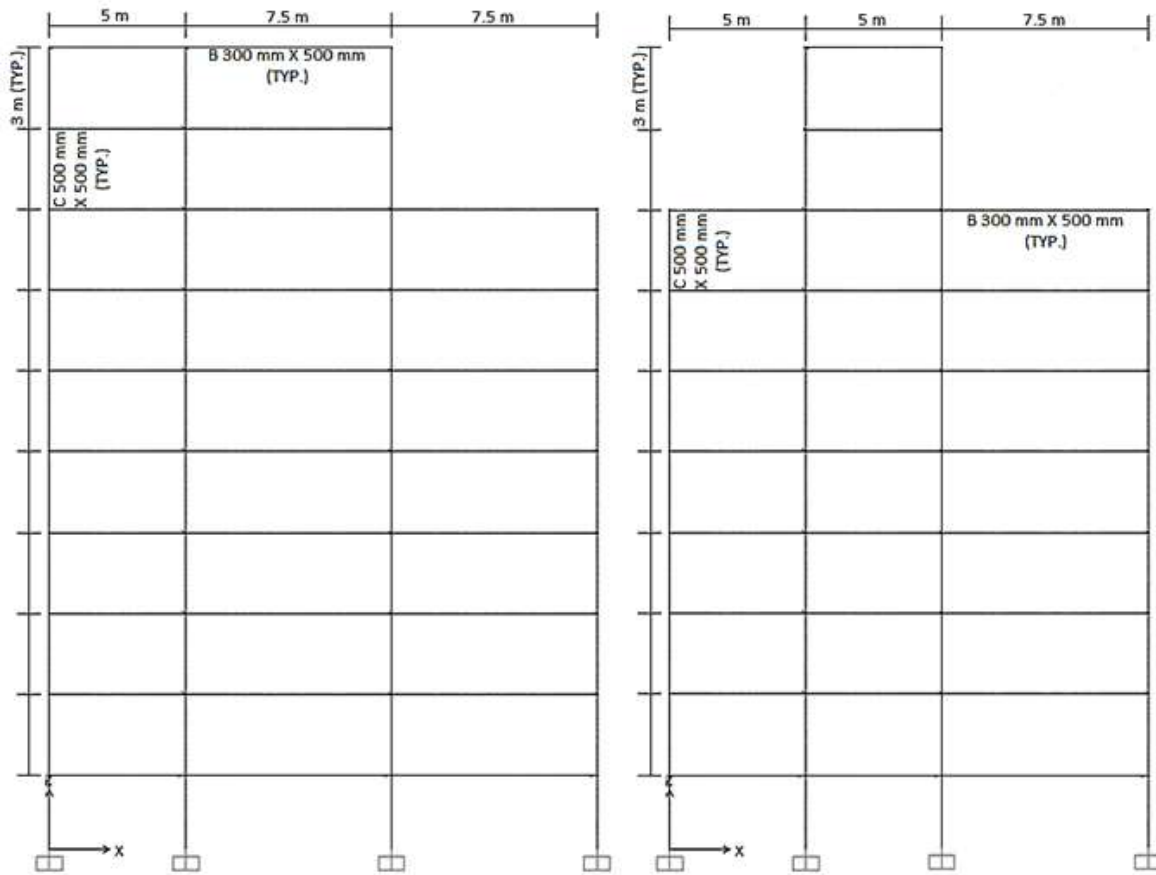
Elevation of the building with vertical irregularity on plane ground
